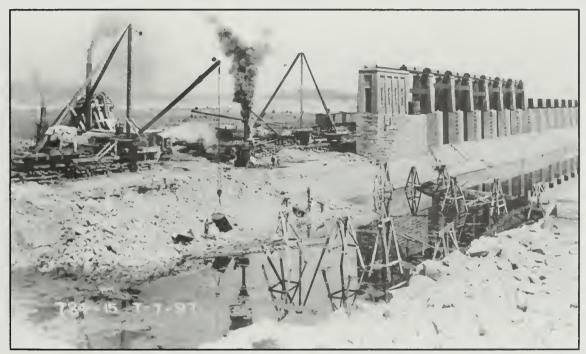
The controlling works of the Chicago Sanitary and Ship Canal at Lockport, under construction in 1899. Photo courtesy of the U.S. Army Corps of Engineers.
